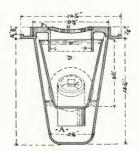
Sectional side view, with dimensions. Fig. 4. End view, large cover open.
